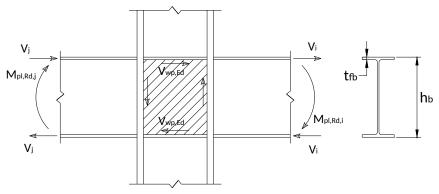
Beam-pillar joint: the core panel of the pillar.
